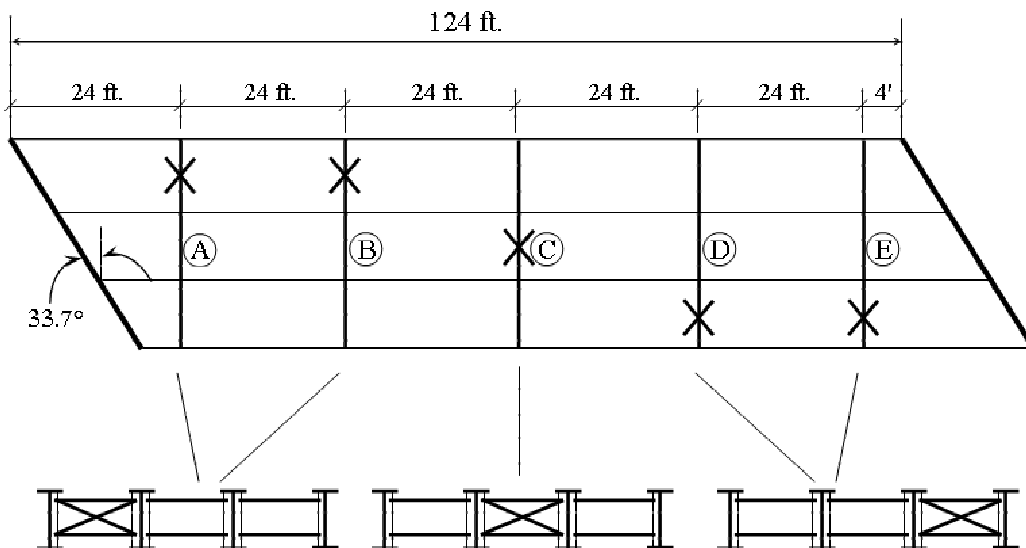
Plan View of Lean-On Layout for Four Girder Bridge
